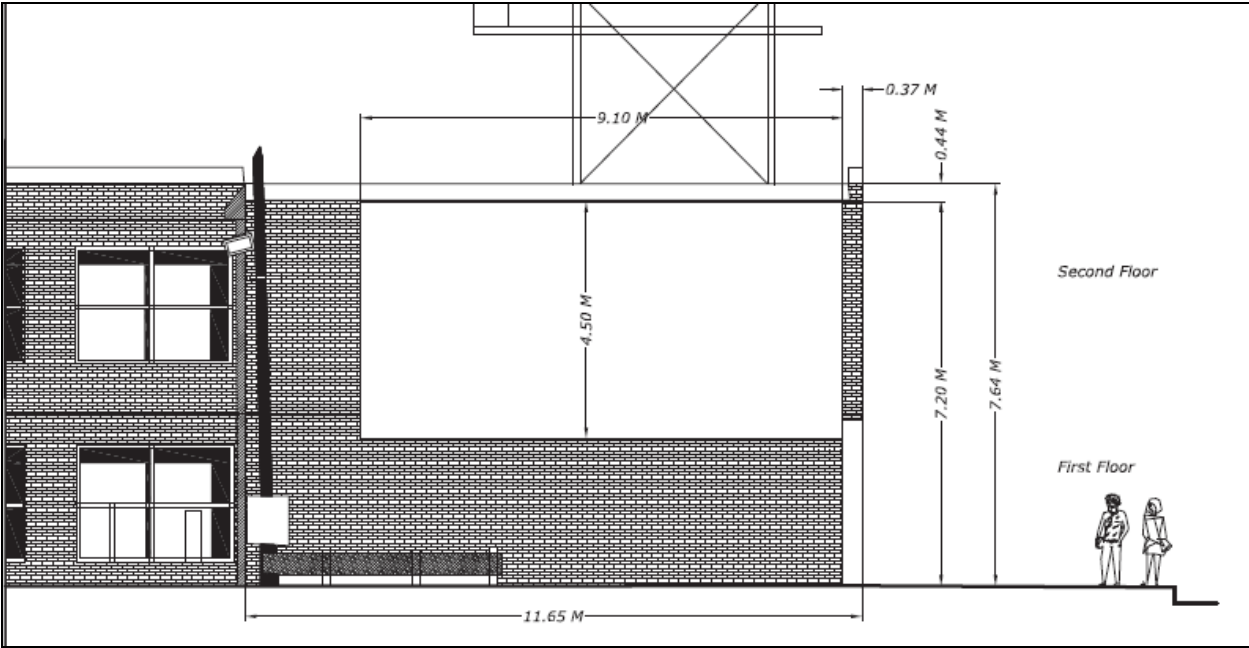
Sketch of Proposed Sign at 101 Spadina Avenue
